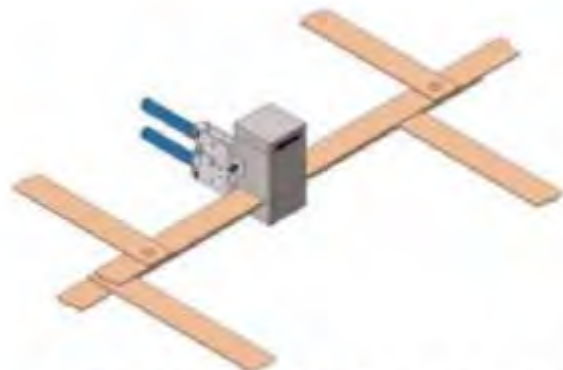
Adjacent Rolls Of Flat-Strip-Type SBG Being Exothermically-Welded Together
